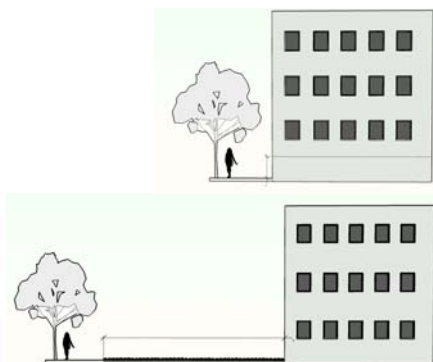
Ground floor residential uses should be elevated above the sidewalk level or set back from the property line to provide privacy.
